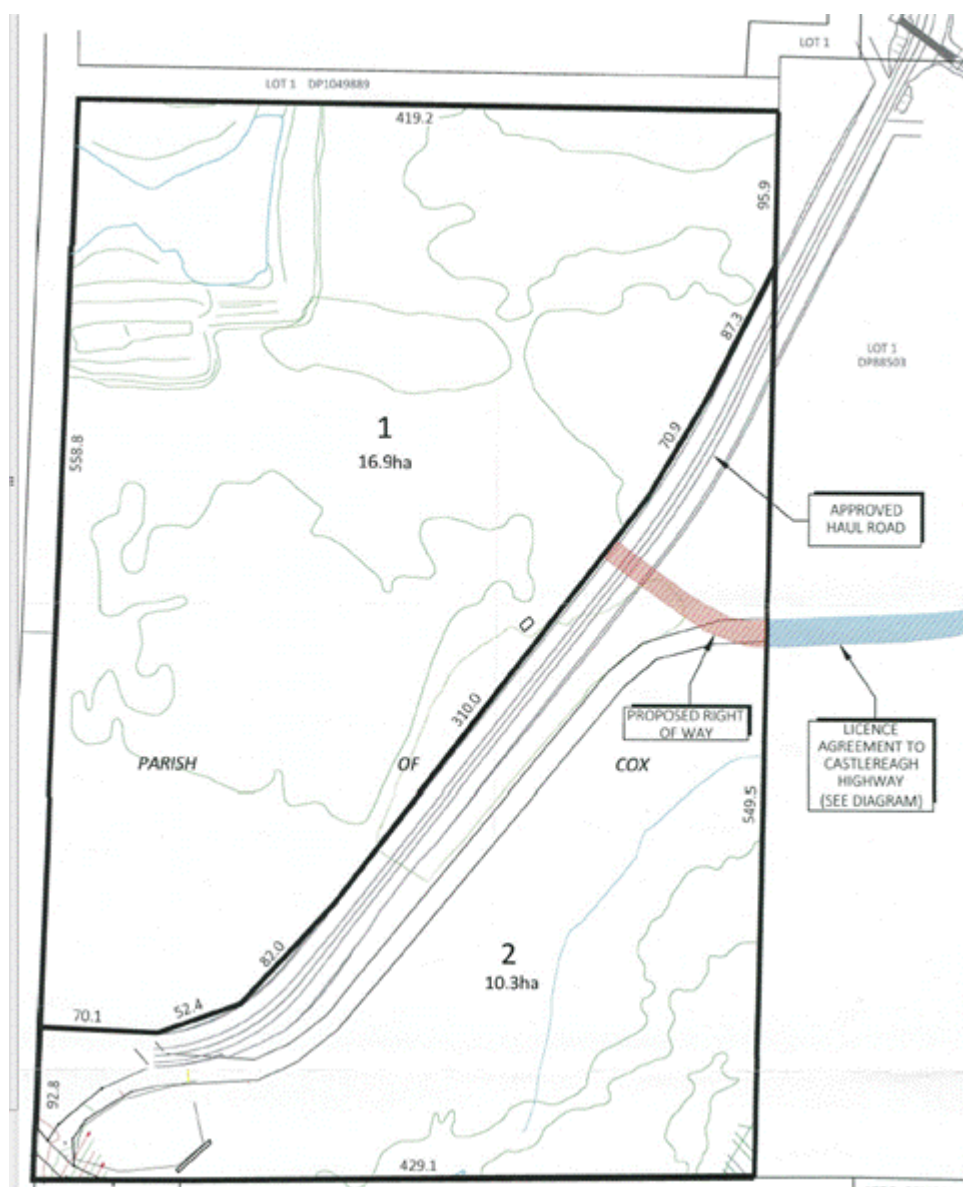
Plan of Proposed Subdivision – 1 lot into 2 – Lot 42 DP 751636
